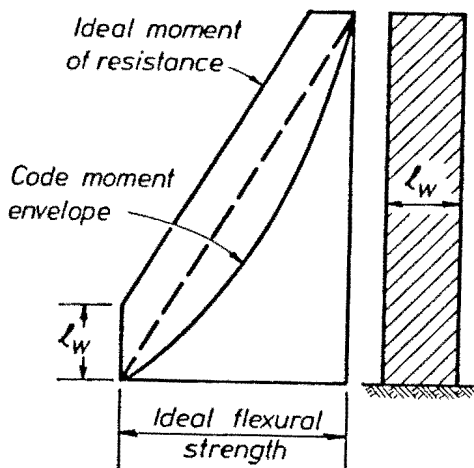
Moment Design Envelope for Cantilever Structural Walls.
